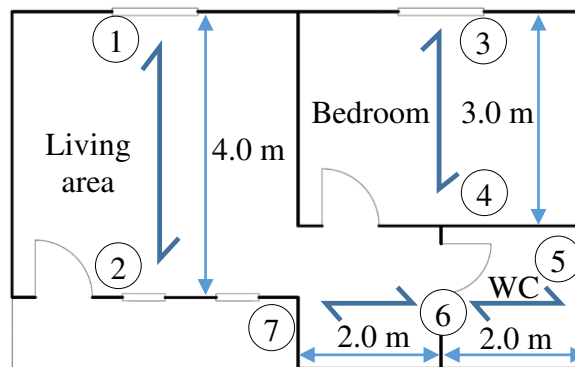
Basic floor plan of the idealised 3DP cob house. Half-headed arrows indicate the span direction of the suspended floor and roof. Loadbearing walls are numbered from 1 to 7.
